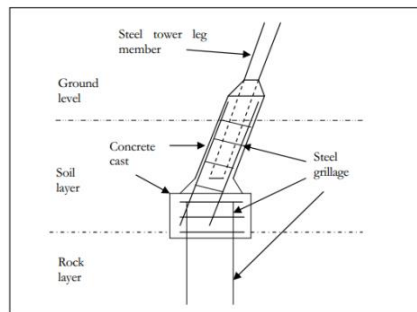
10 typical construction of transmission tower rock anchor foundation [13]
